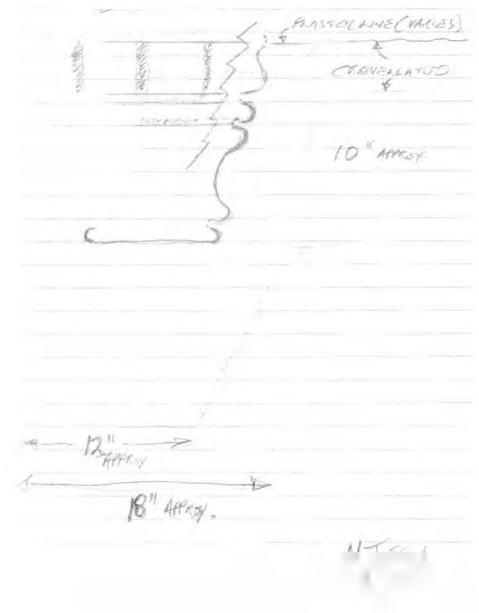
a: Moulded beam in the ceiling of the ground floor chamber.
